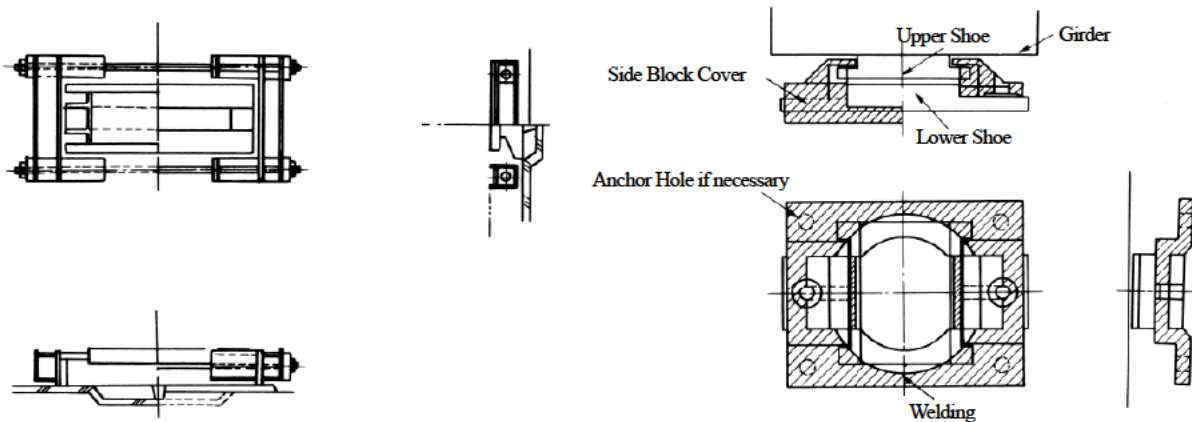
Installation of Reinforced Frame (Example 1) Figure 4.4.33 Installation of Reinforced Frame (Example 2)
